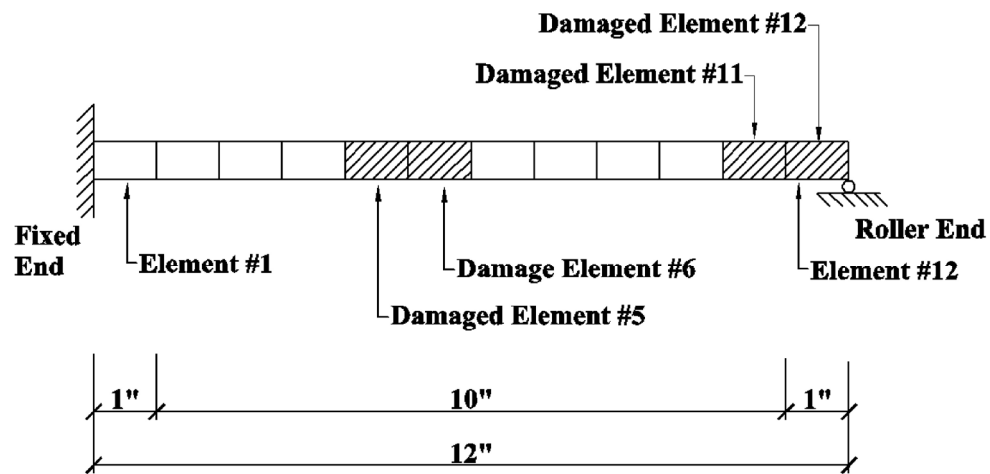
Geometry, Damage Scenario, and Load Case for the Propped Cantilever
